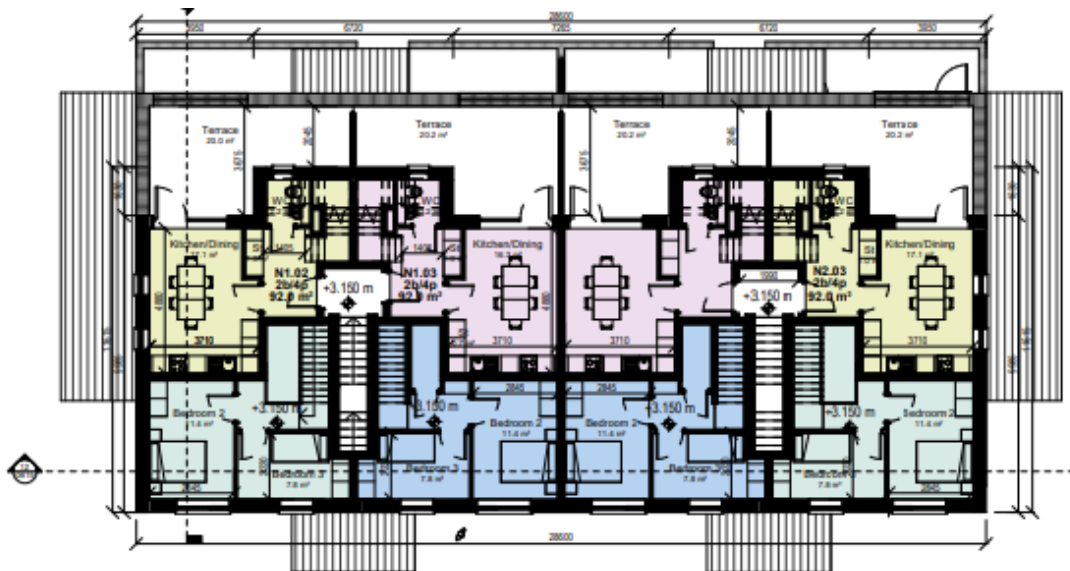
Proposed first floor plan of Duplex Block Type N
